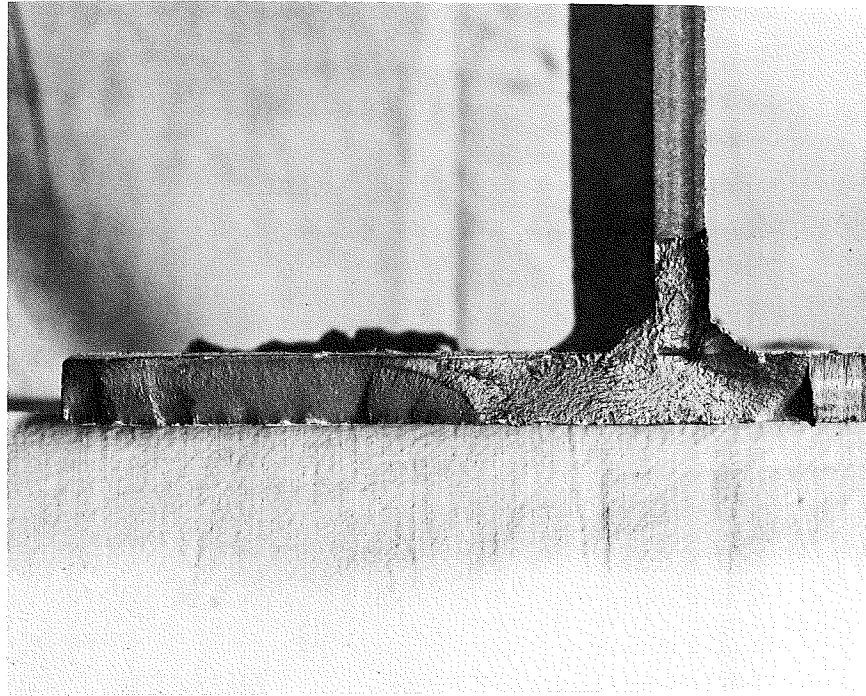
Typical Fatigue Crack Surface at Flange Attachment with Transverse Weld
